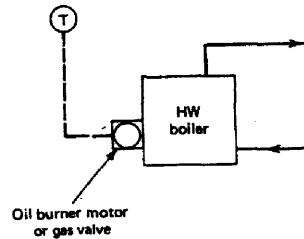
Space control of HW boiler burner motor or gas valve.
